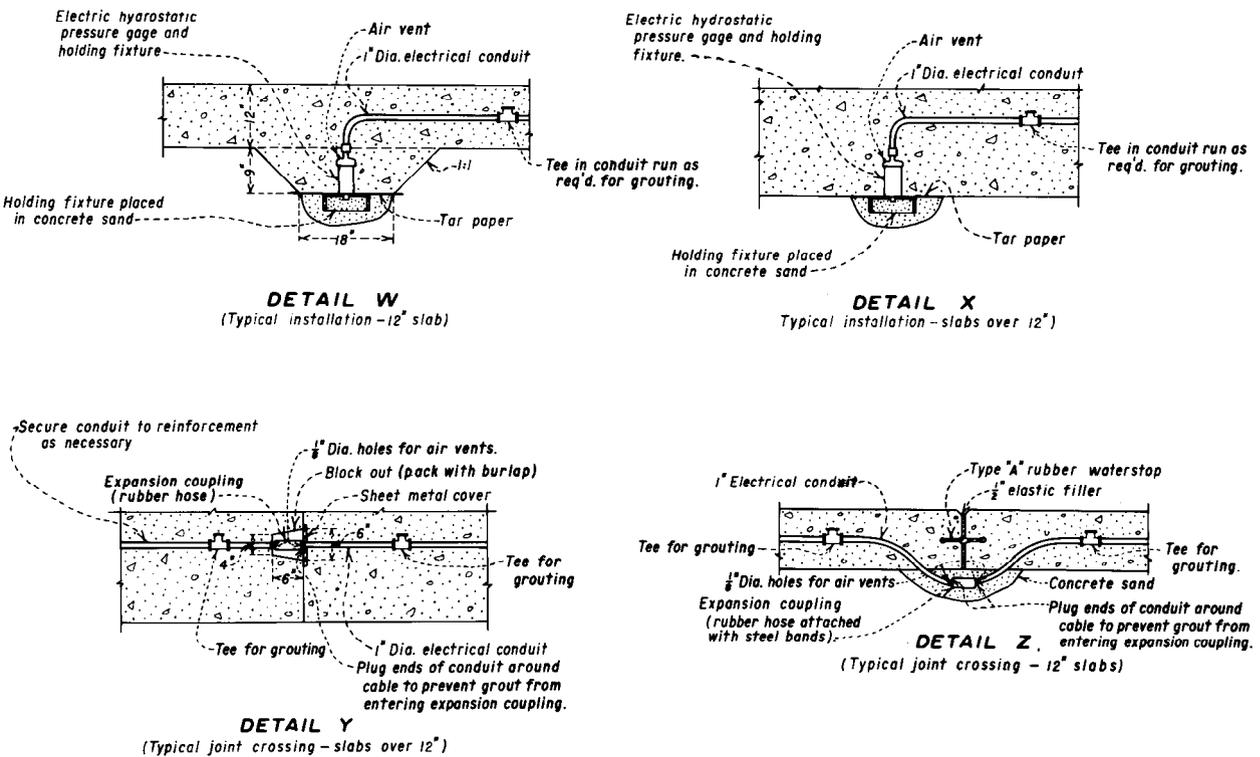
Details of pore pressure meter installation illustrated on figure 13-33.—288-D-3103
